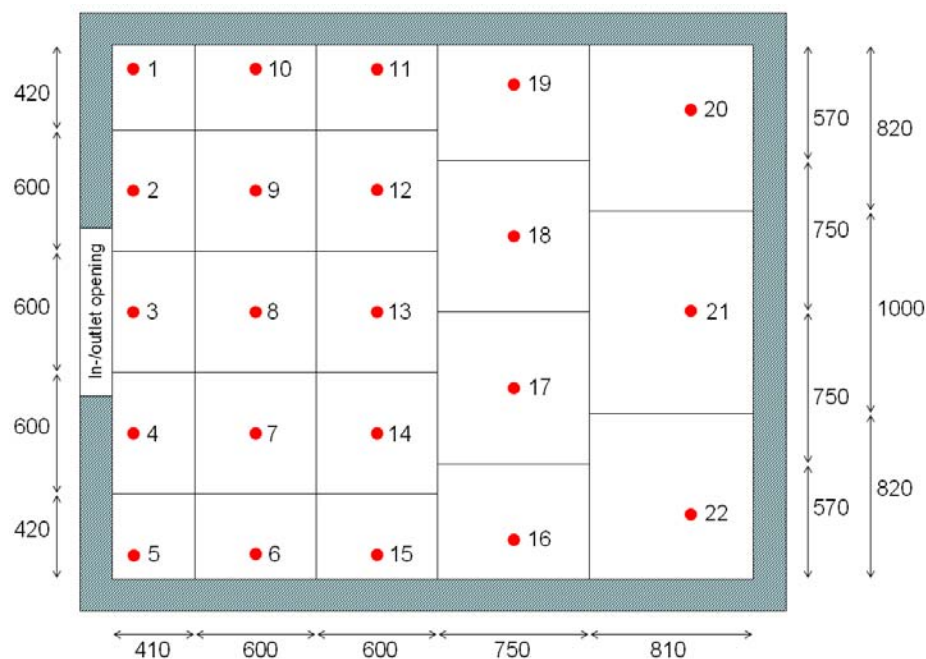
Subdivision of the ceiling into 22 sections and location of sensors (top view).
